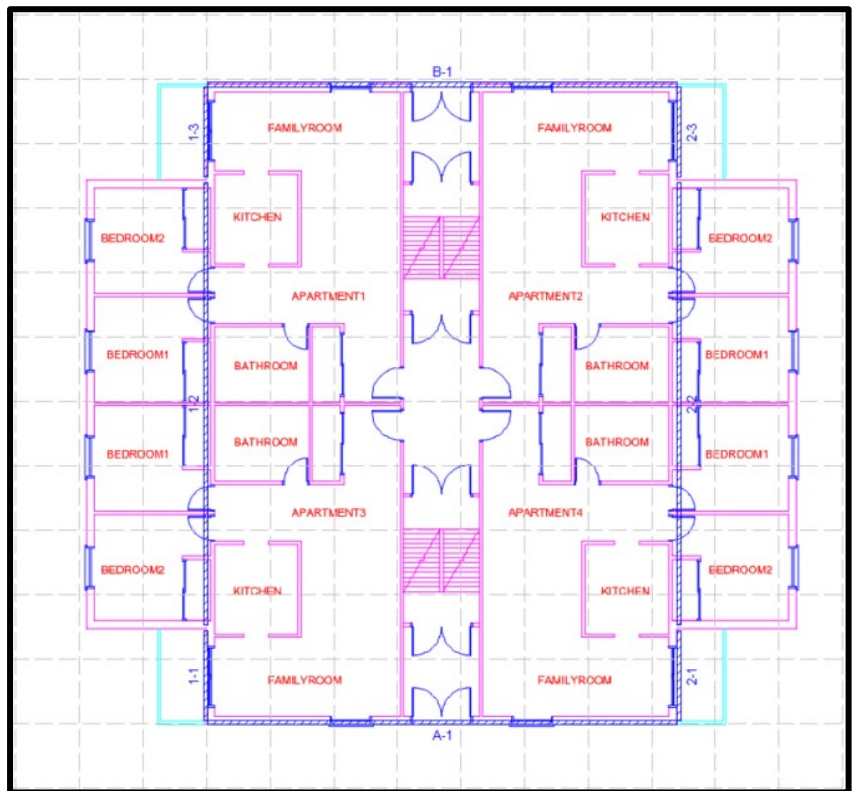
Shearwalls Tutorial 6 – Splitting Shearline 1 and 2 (With CAD Drawing)
